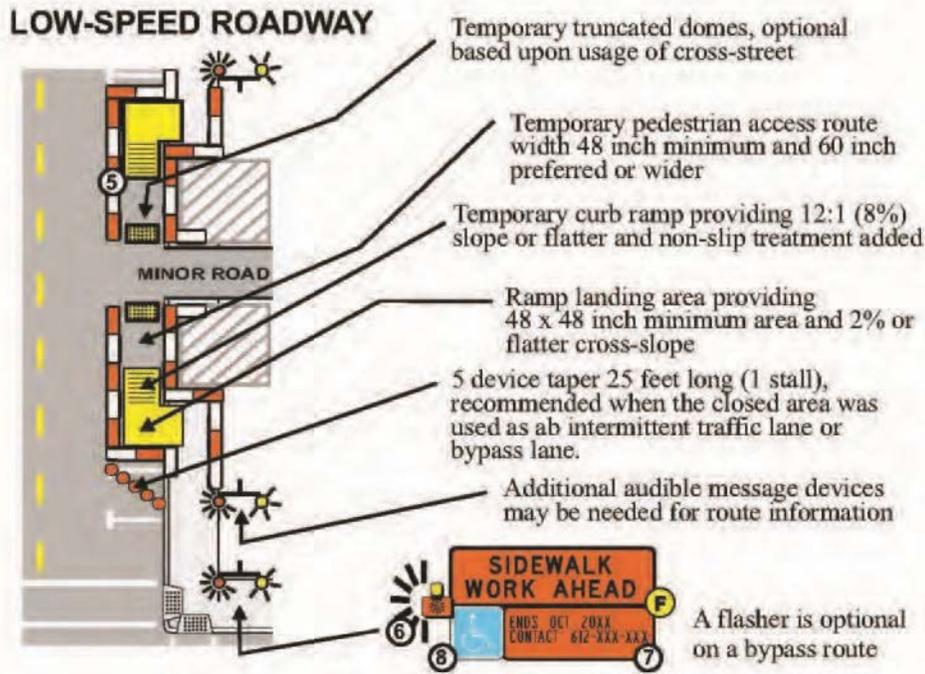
Minnesota DOT Drawing 85a: Sidewalk By-Pass on a Low Speed Roadway
